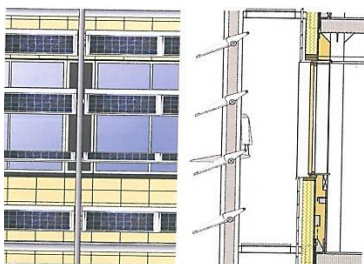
Detail and section of PV shading system on façade of Energy Research Foundation (ECN) - Building 31 in Netherlands (Prasad and Mark, 2005).
